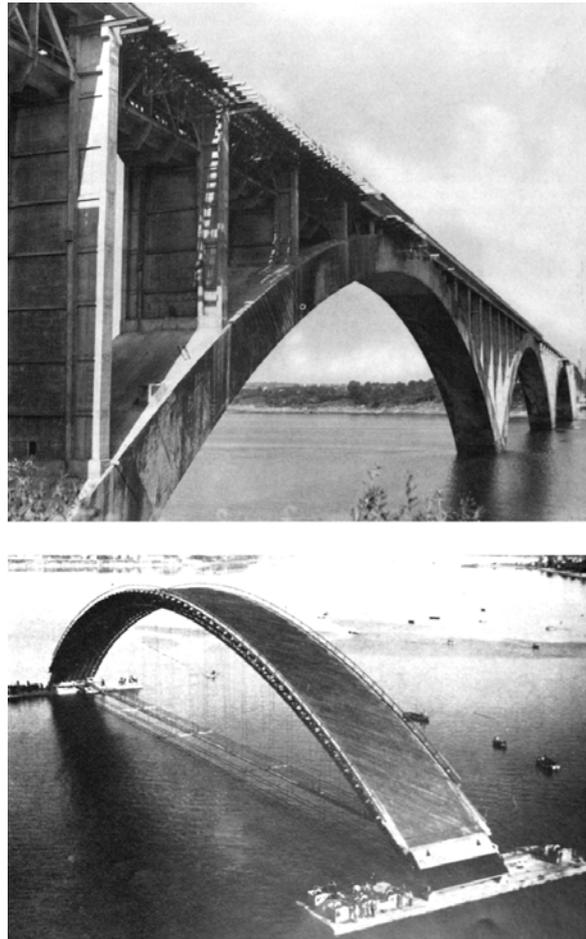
(a) Elorn Bridge with three spans of 186.4 m each, Freyssinet, 1930. (b) Self-supporting centering used to construct the Elorn Bridge being floated into place. (Wittfoht)
